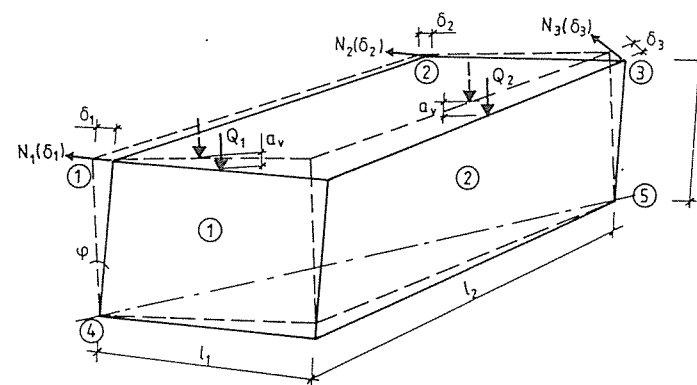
An alternative load-bearing system at the corner of a building after loss of the outermost support.
